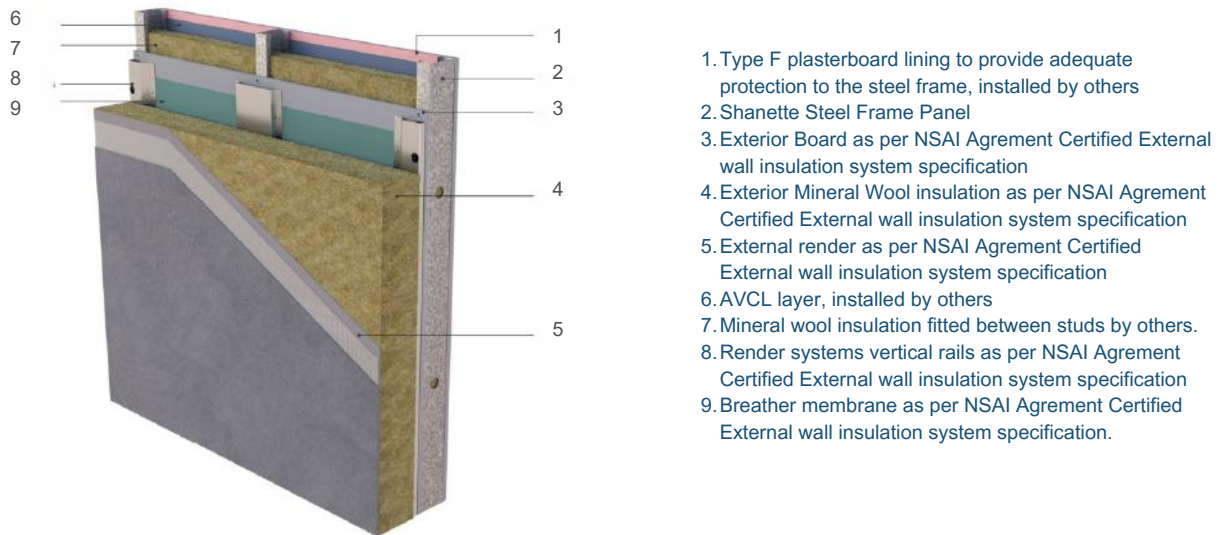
External Wall with NSAI Agrément Certified External Wall Insulation Façade System – Hybrid Frame
